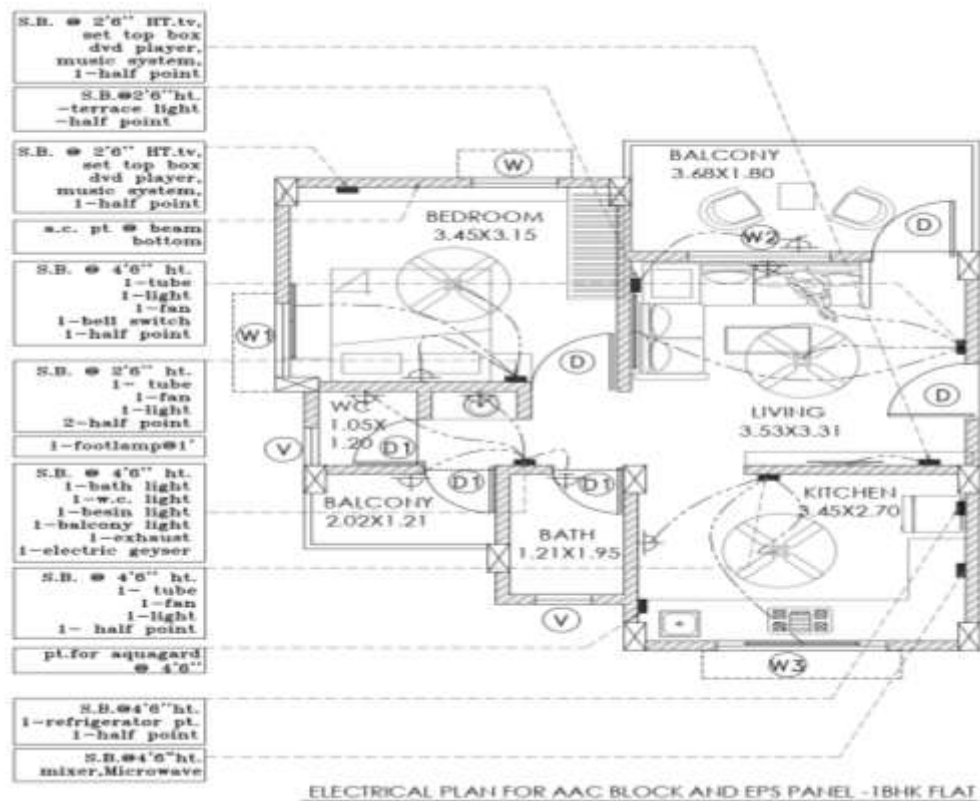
Electrical Layout For AAC block & EPS Panel walling Construction for simulation
